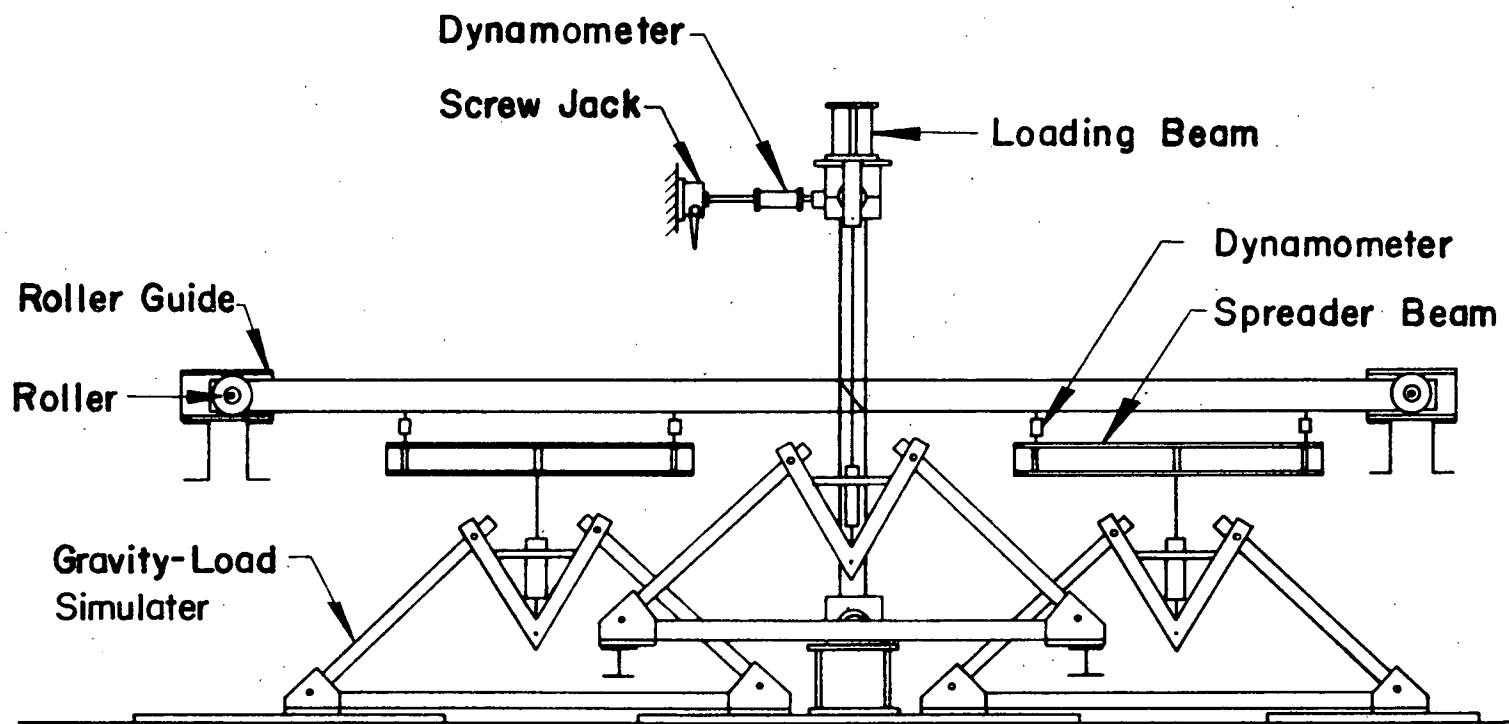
SCHEMATIC SKETCH OF TEST SETUP FOR TEST SPECIMEN RC-2
